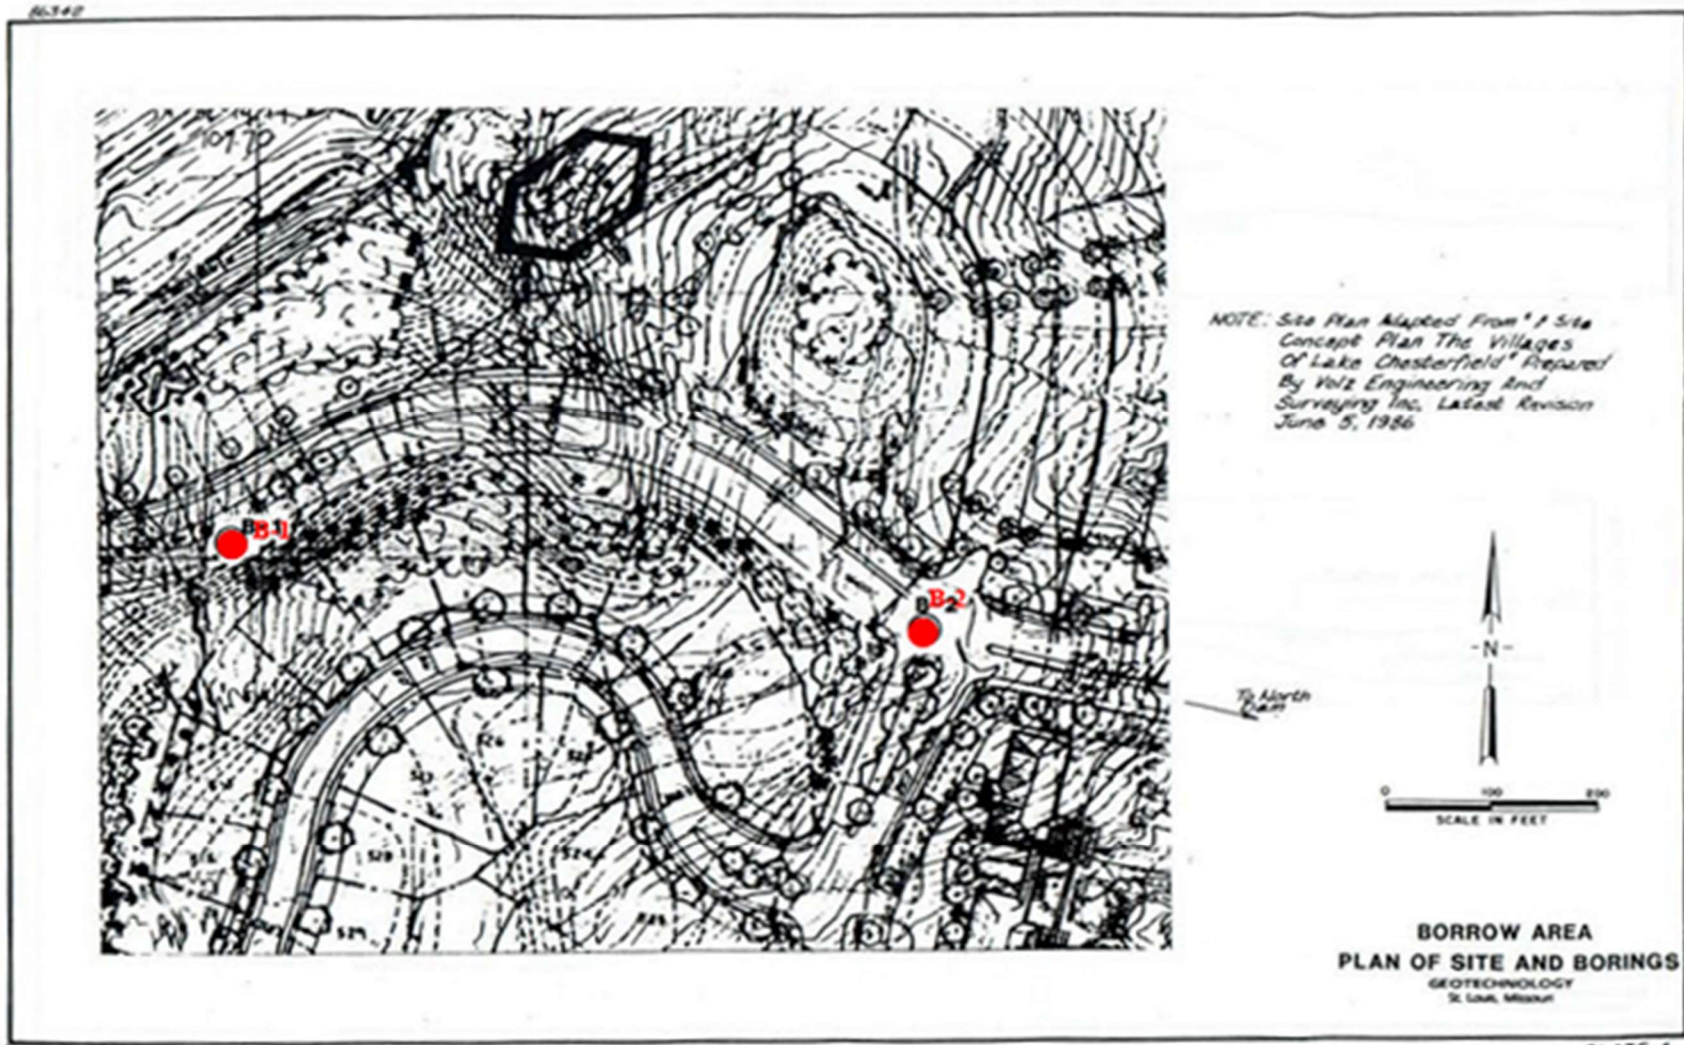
Borrow area plan of site and borings (Geotechnology, Inc., 1986) .
